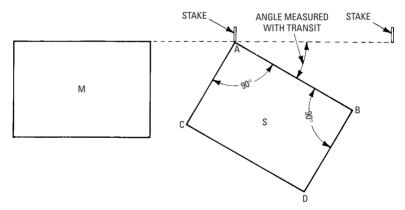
The method of laying out a new building (S) at a given angle with an old building (M). After the corner and the direction of one wall are determined, a right angle may be laid off (if the building is rectangular), thus locating two of the sides (AB and AC). The length of side AB is then measured, thereby locating corner B. The transit is set up at B, and line BD is laid off at right angles to AB. AC and BD are then laid off by the proper length, and the four corners of the building are thus located. If the building had not been rectangular, the proper angles could have been laid off instead of right angles.
